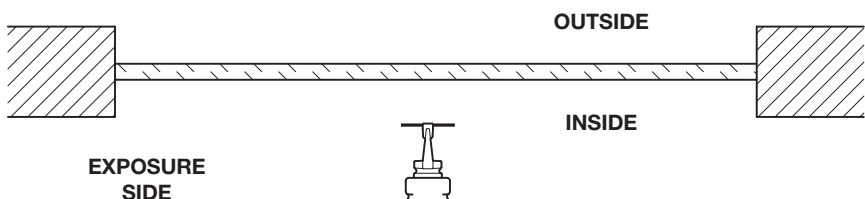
A-2 - EXTERIOR FIRE SEPARATION - SPRINKLERS INSIDE
